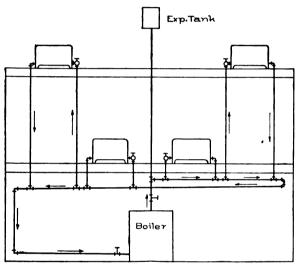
System of Hot-Water Piping Especially Adapted to Apartment Buildings where Each Flat Has a Separate Heater.
